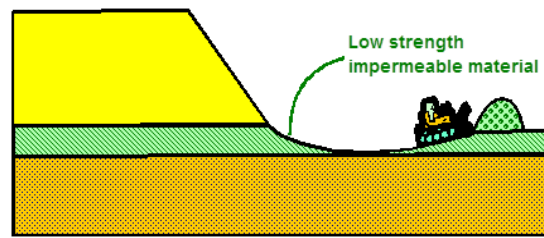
Dump foundation improvement. Low strength material removal at the dump base for dump foundation improvement
